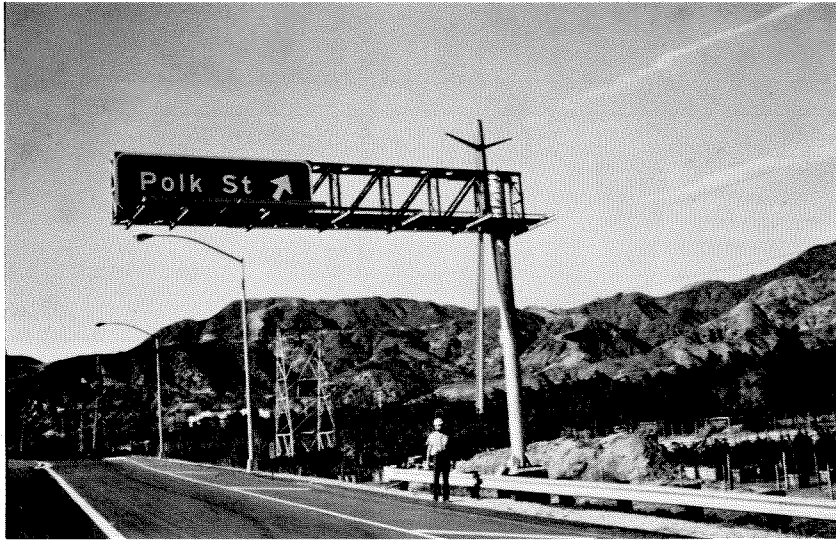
A cantilevered, eccentric freeway sign near Polk Street on the Foothill freeway was undamaged by the earthquake. Olive View Hospital is in the left background.
